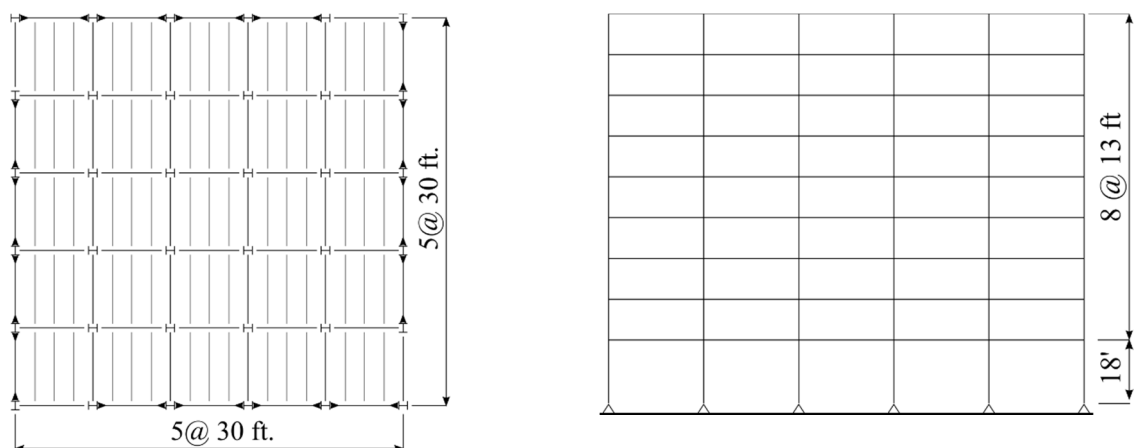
9-story steel building: plan view (left) and elevation view of a gravity frame (right).
